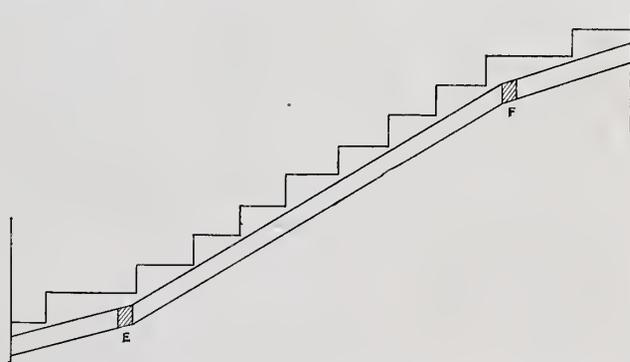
Section showing the Top Brace with the Center Timber Meeting it at F.
